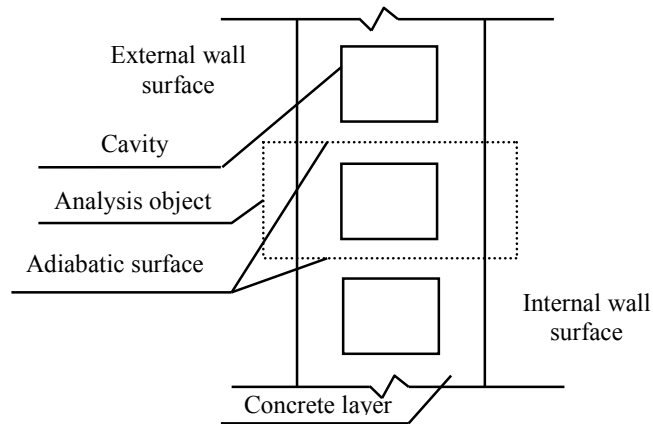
Schematic of the cross section of the hollow block ventilated wall.
